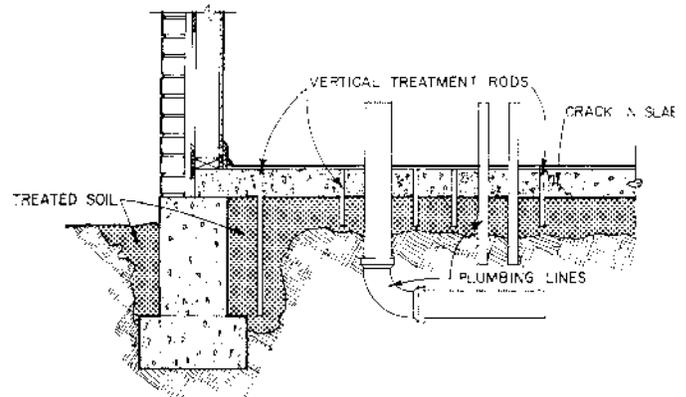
Treatment under concrete with vertical drilling at joints, cracks and openings, and around plumbing.
